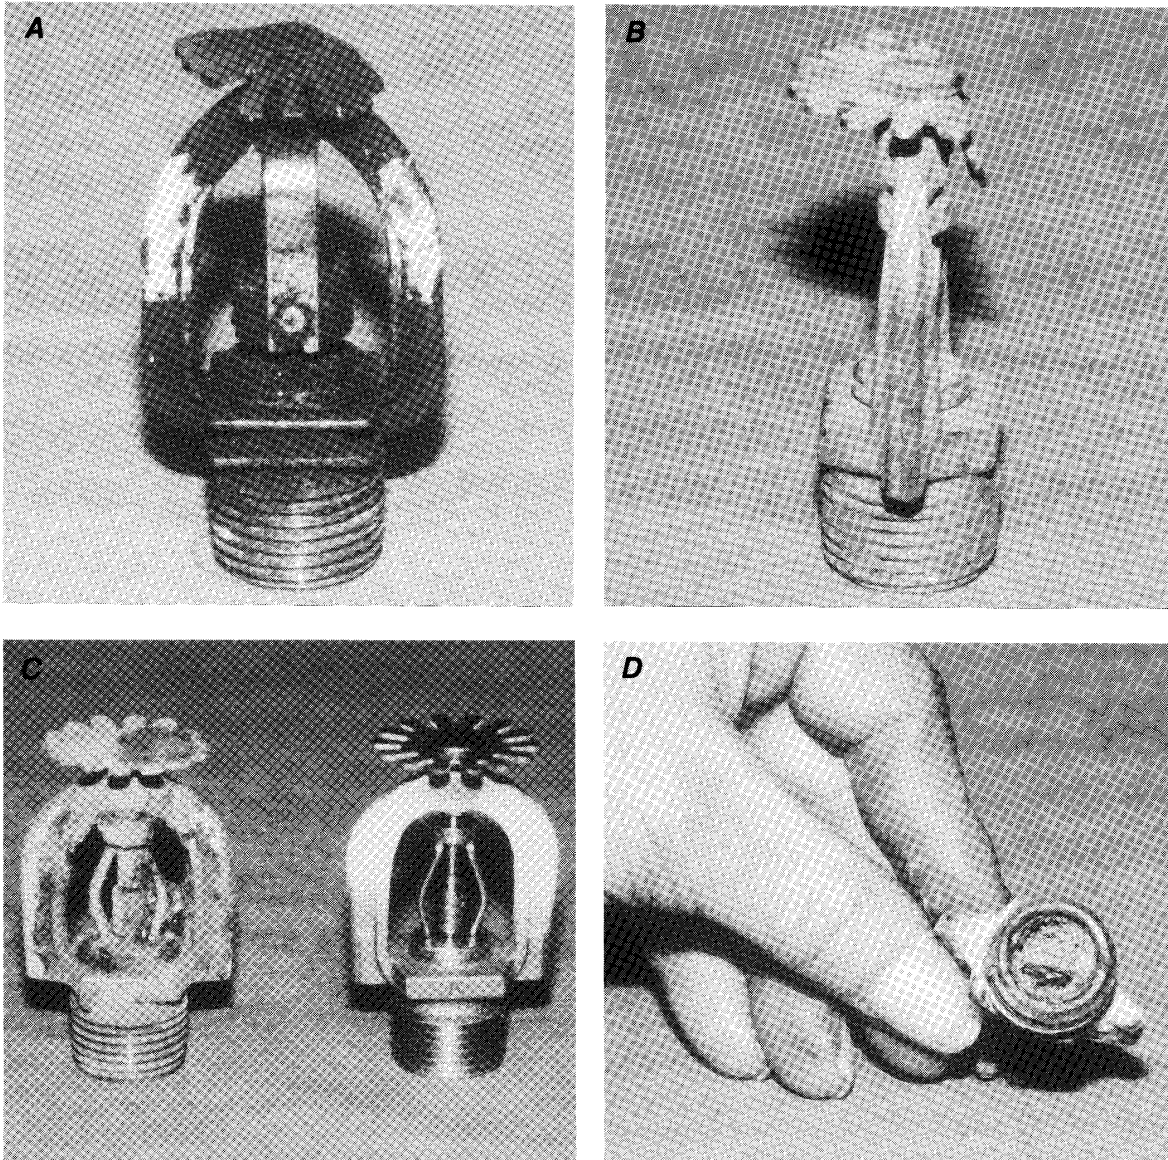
Examples of exposed sprinklers. A, Damaged sprinkler; B, damaged sprinkler; C, exposed sprinkler (left) versus new sprinkler (right); D, sprinkler plugged with pipe scale, stones, and/or other foreign material.
